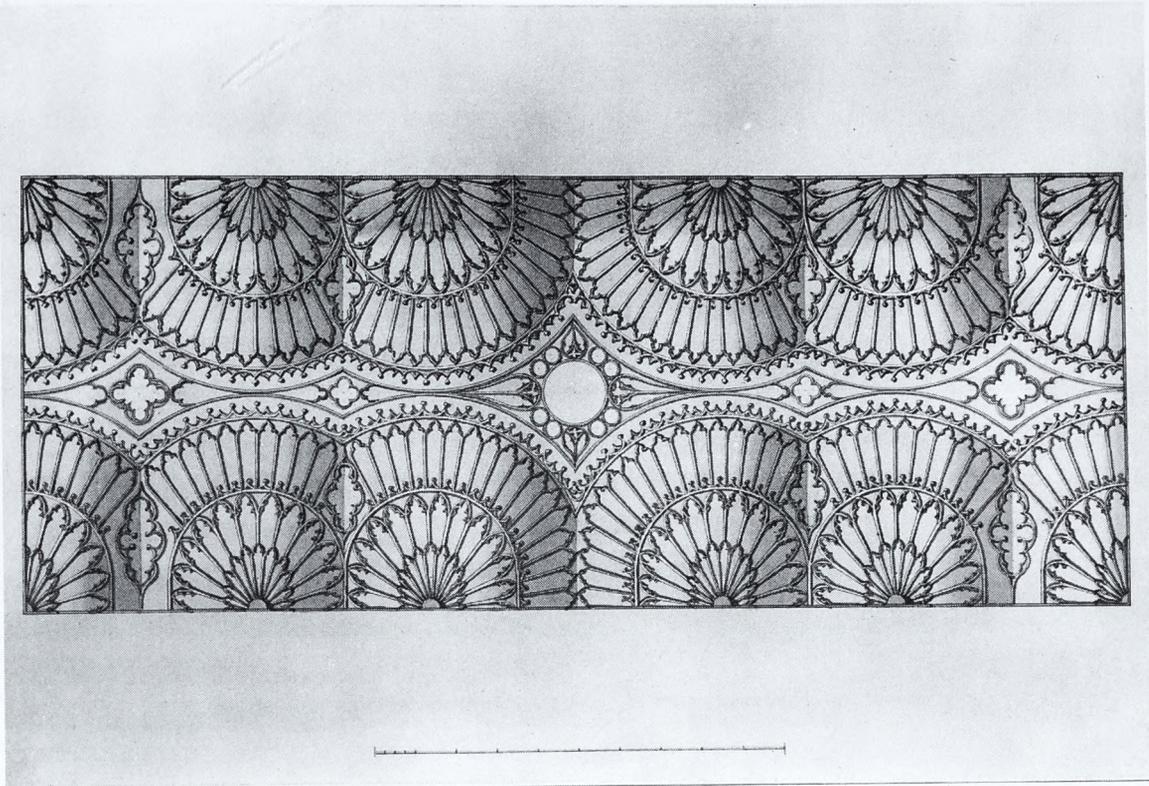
Ceiling plan of proposed family pew, Audley End House. *English Heritage*.
